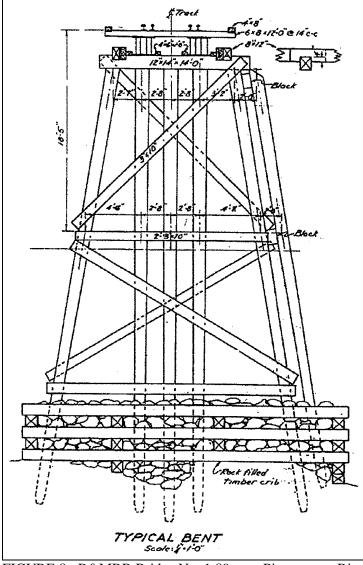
B&MRR Bridge No. 1.89 over Piscataquog River, West Manchester, NH. Section of typical bent. [Source: "Record Plan, B&MRR Bridge No. 1.89 (404) West Manchester." Dated 3/10/42]
